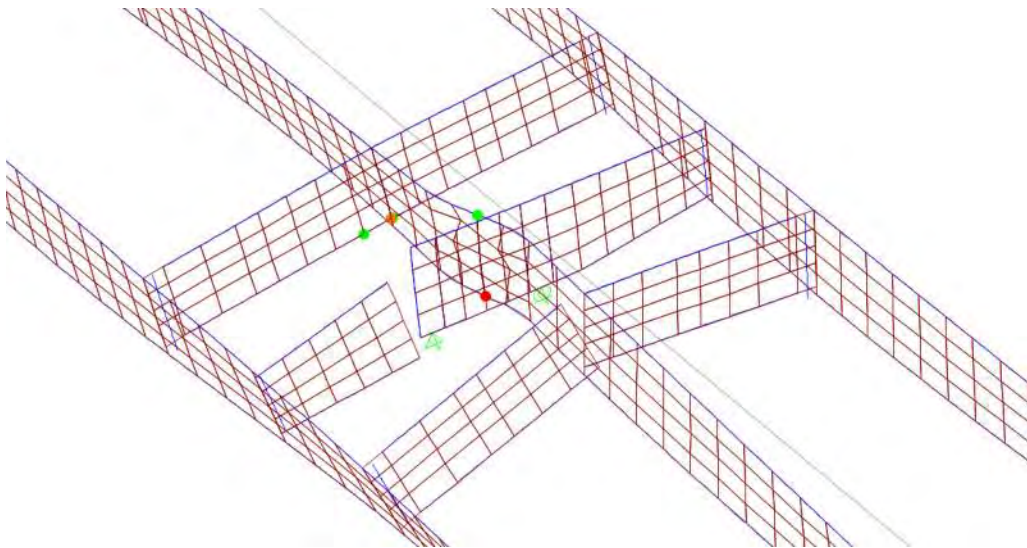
Independent Model at 3.7 x HL93 loading after redundant load path diaphragm connection failure (Deck not shown for clarity).
